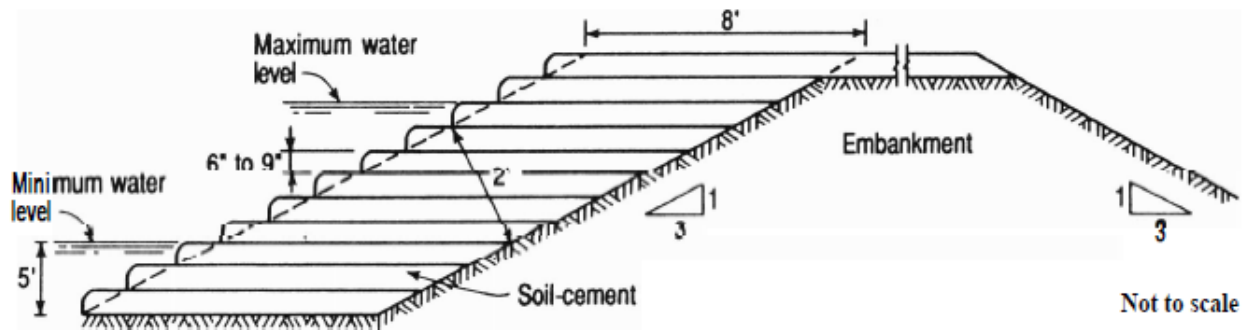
Soil-Cement Slope Protection Showing Layered Design (AC Institute 1997)
